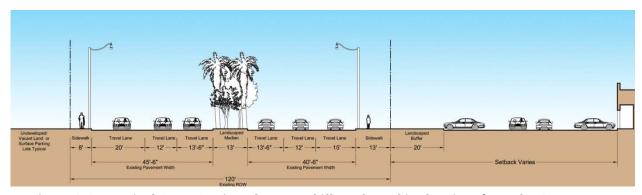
Typical Cross-Section along Foothill Boulevard in the City of Rancho Cucamonga
